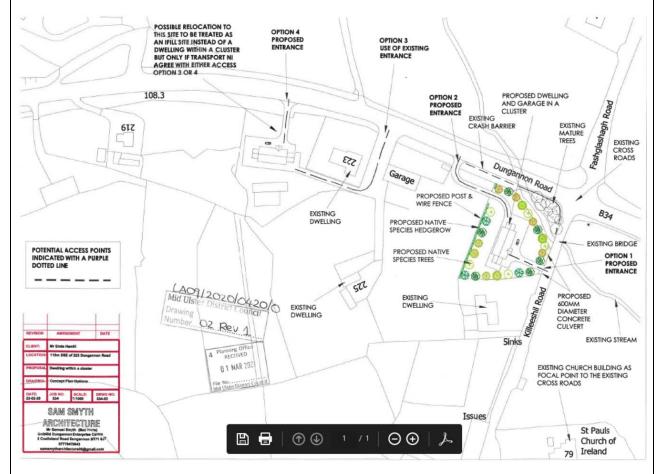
Concept Plan of Alternative access off the Dungannon Road.
